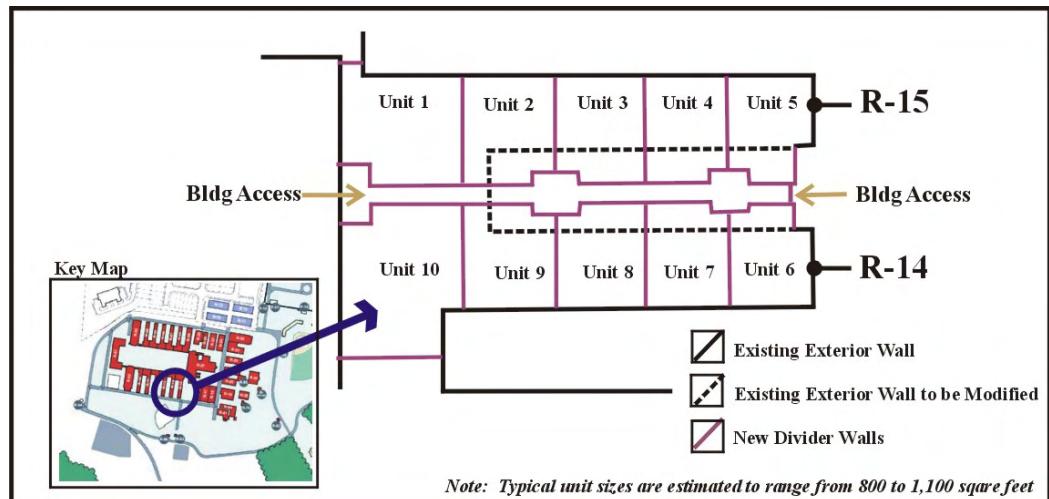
Typical Conceptual Floor Plan for Residential Use at the Reformatory
